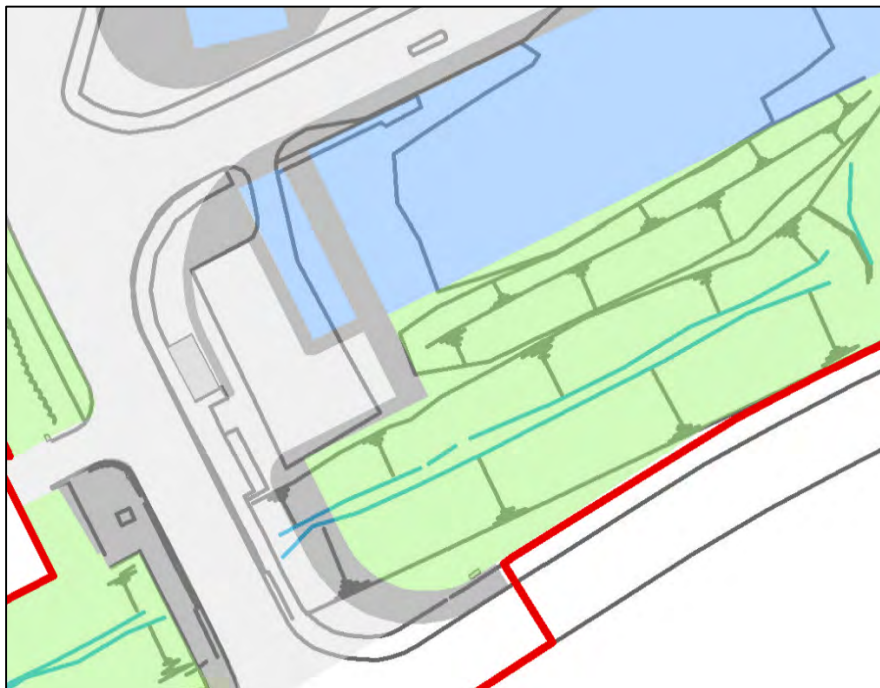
Existing and proposed Application Site layout – improved Advent Way access
